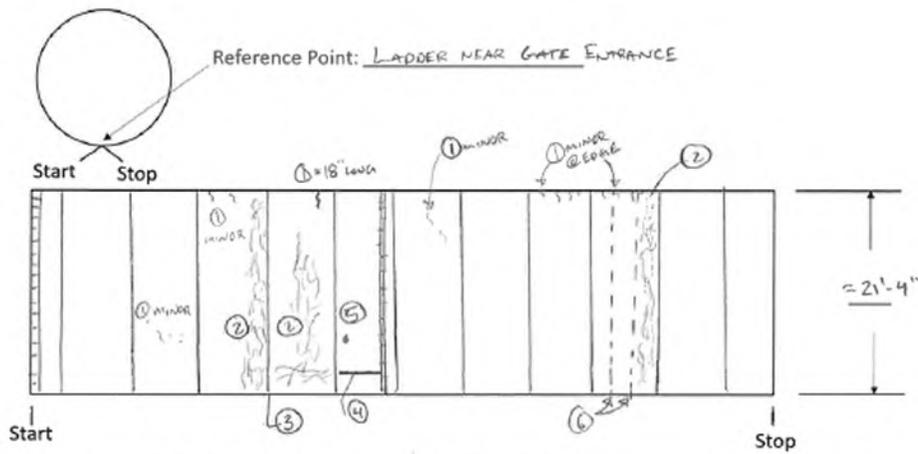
Reservoir EXTERIOR WALL Elevation– Note location of ladders and other features.
